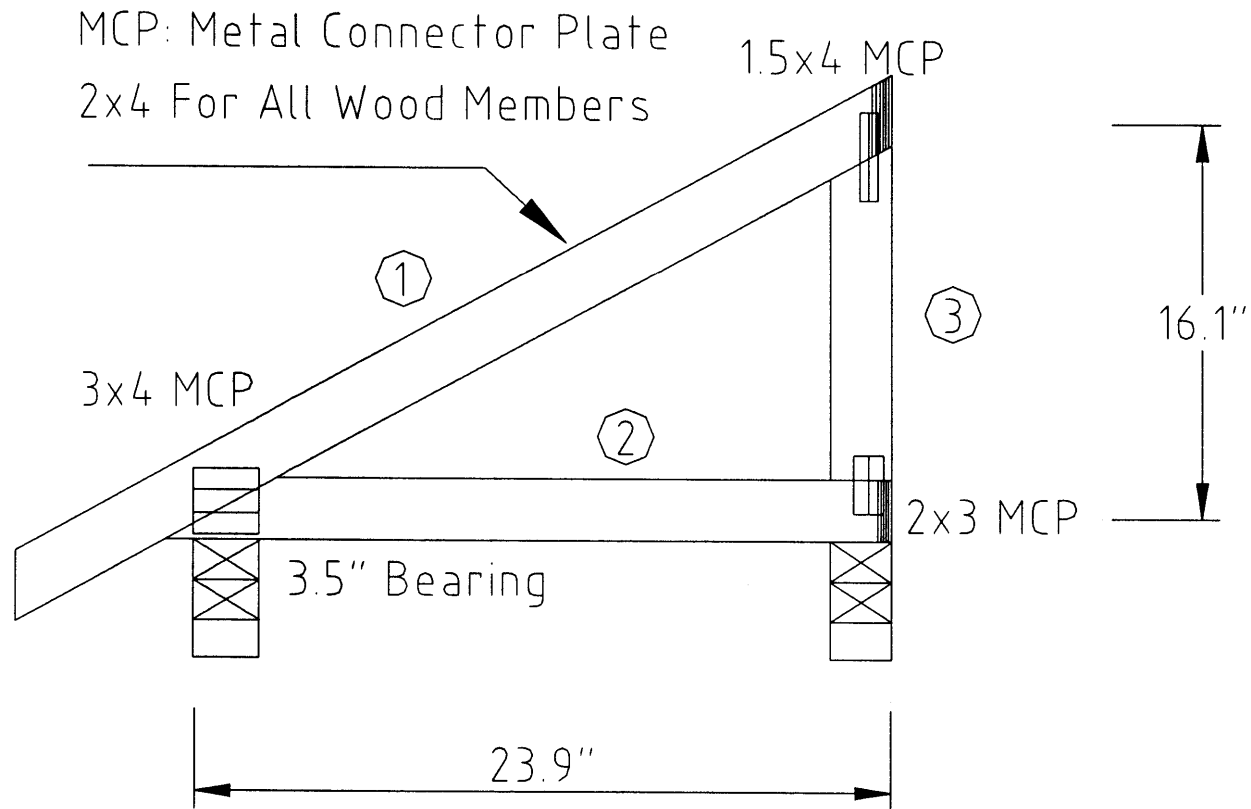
MPC Truss Type J3 from a Truss Plate Manufacturer
